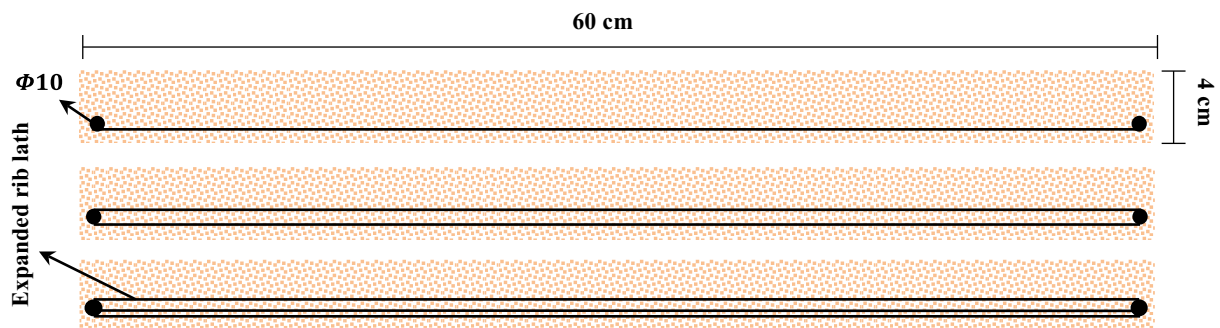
Cross-sectional view of the FSPs with different number of expanded rib lath layers.
